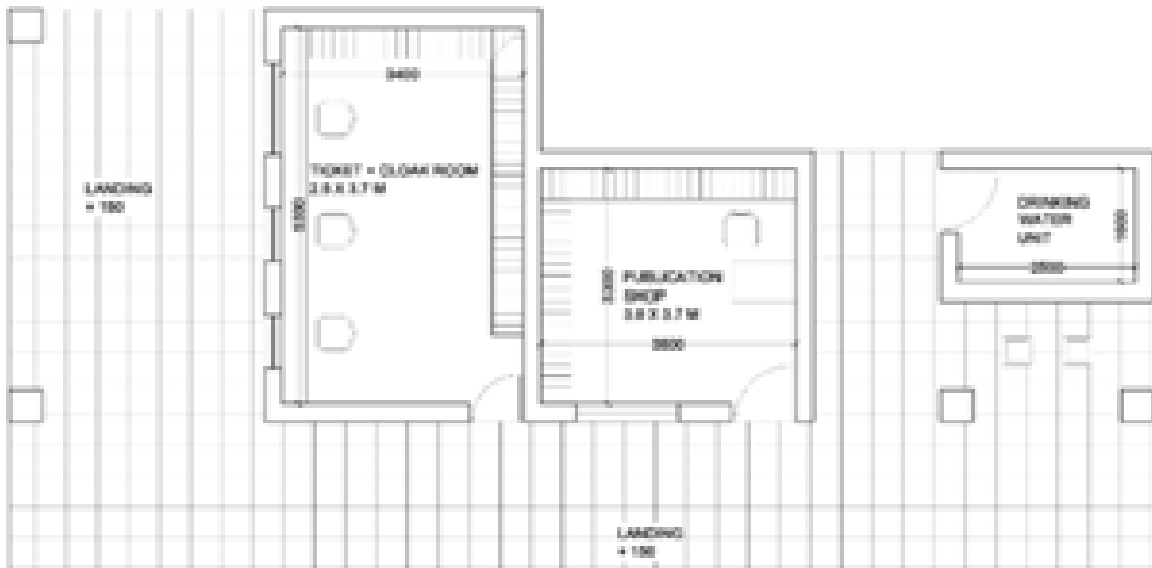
Concept layout for ticket room , cloak room , publication shop and drinking water.
